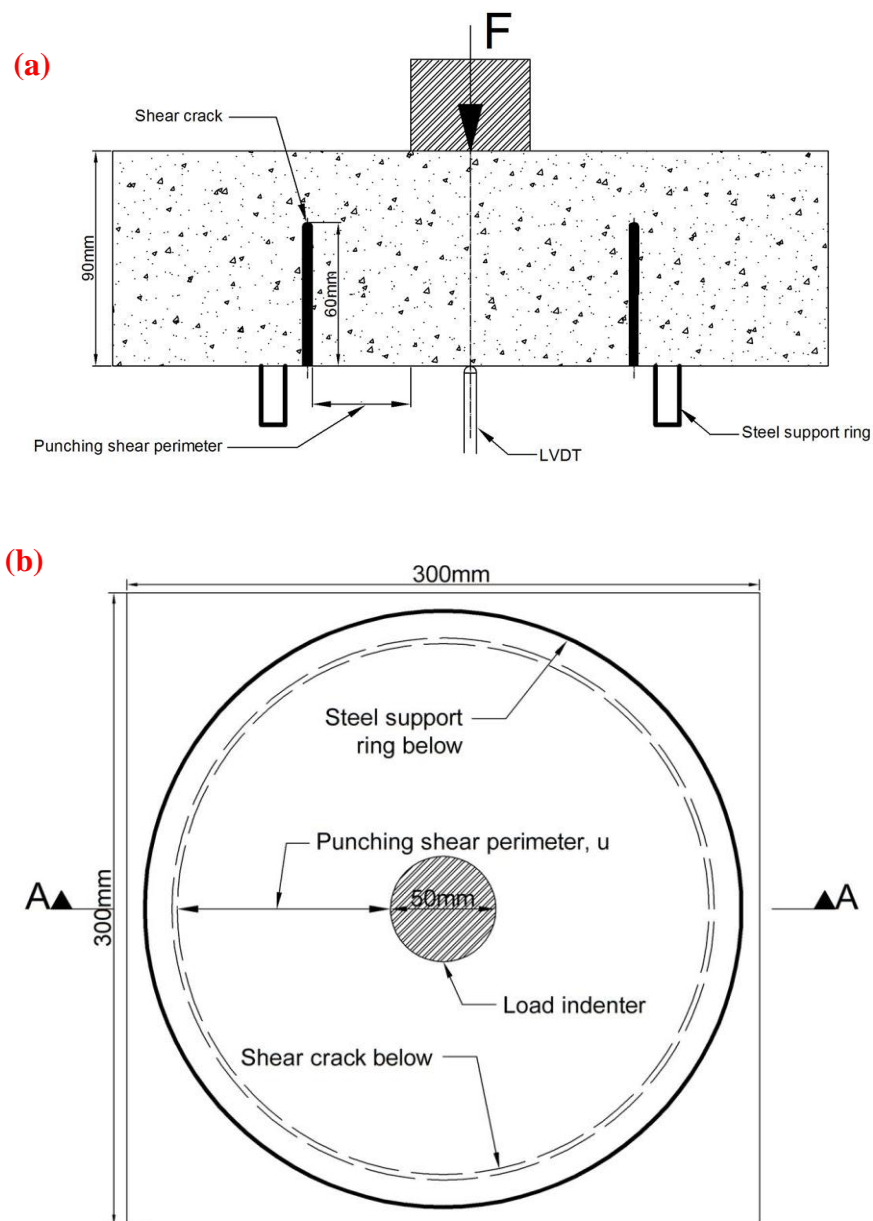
The final test setup: (a) Section view, and (b) Plan view.
